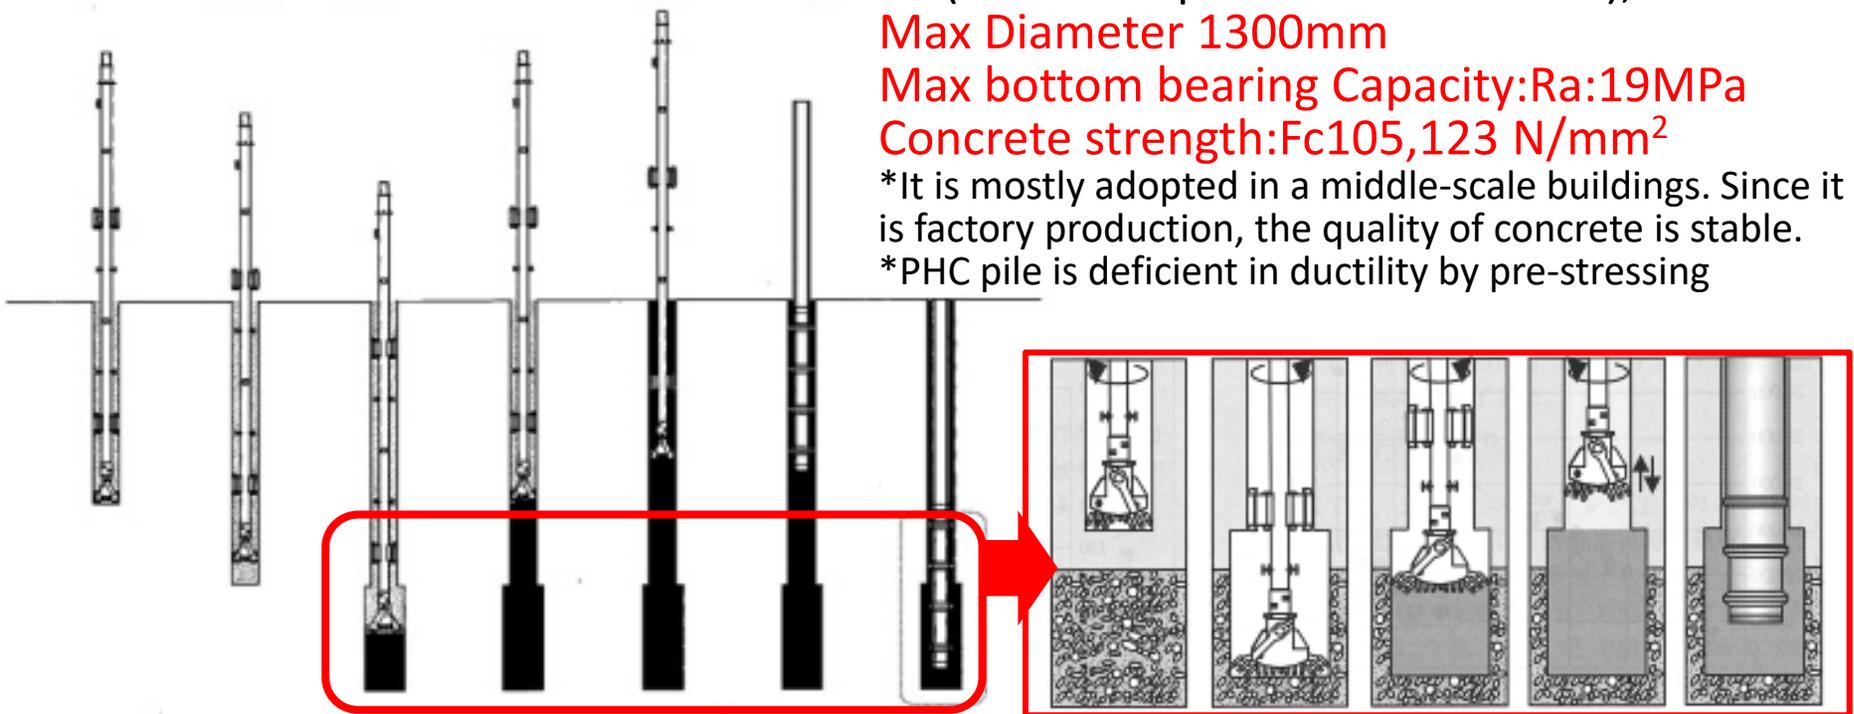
Construction procedure of two major piling method, part of pile specification (Pre-bored with enlarged base method for precast concrete piles.)
